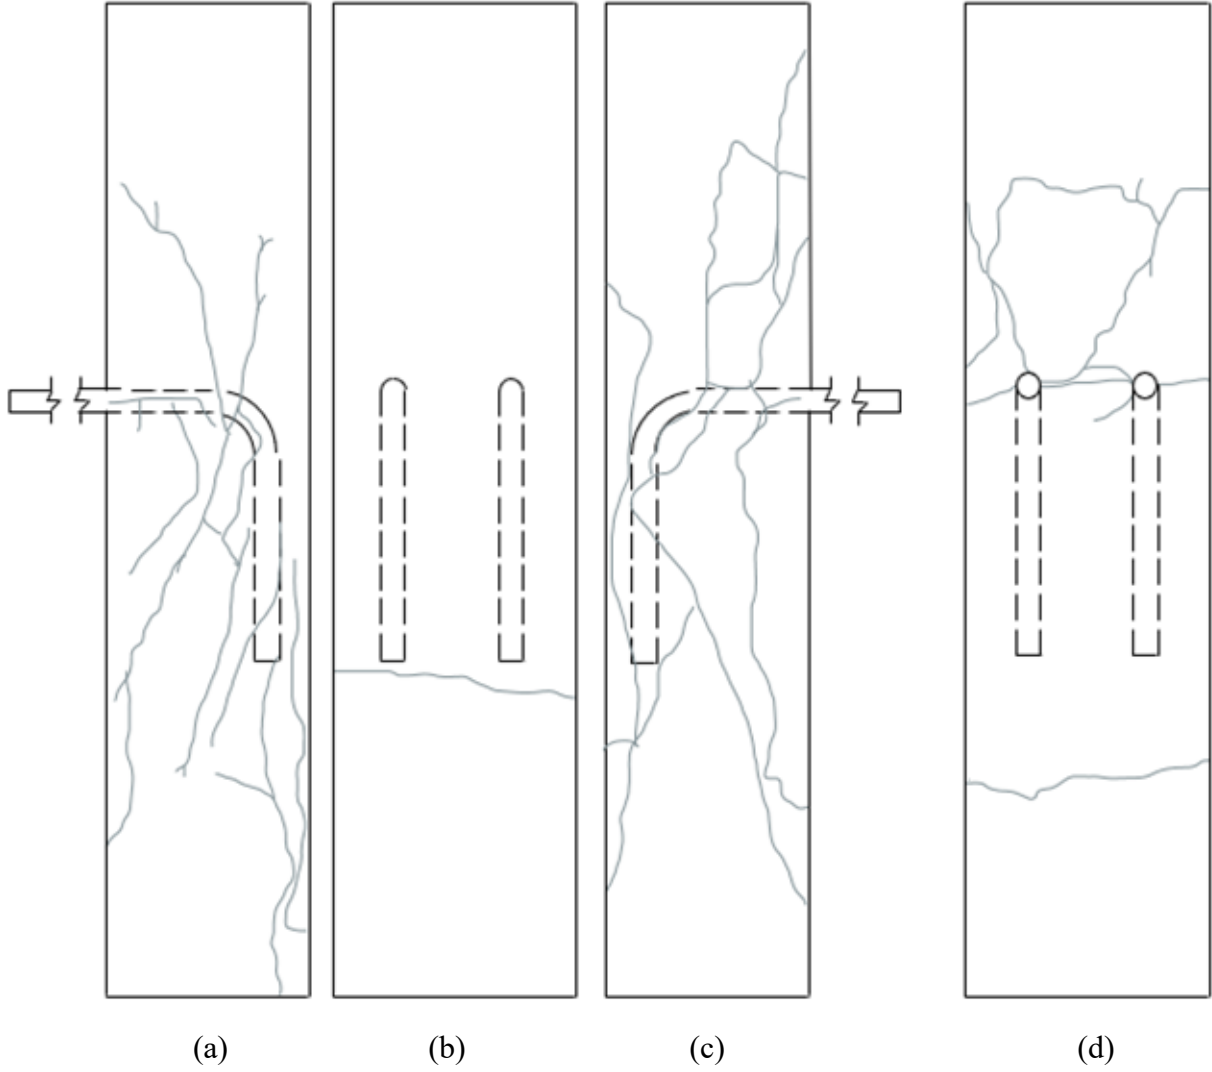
Crack pattern at maximum normalized tensile load for beam-column joint specimen P6-90: (a) west side face, (b) back face, (c) east side face, and (d) front face
